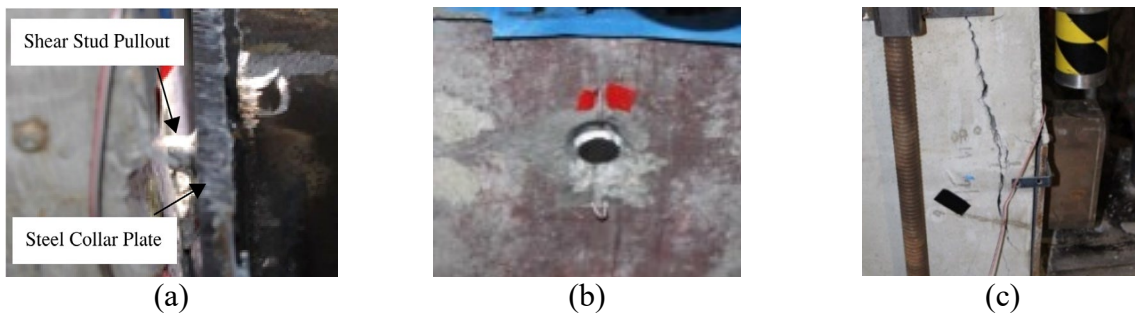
Failure modes: (a) yield-pullout-tensile fracture mode I; (b) shear stud shear fracture mode II; and (c) concrete cracking-shear stud pullout failure mode III.
